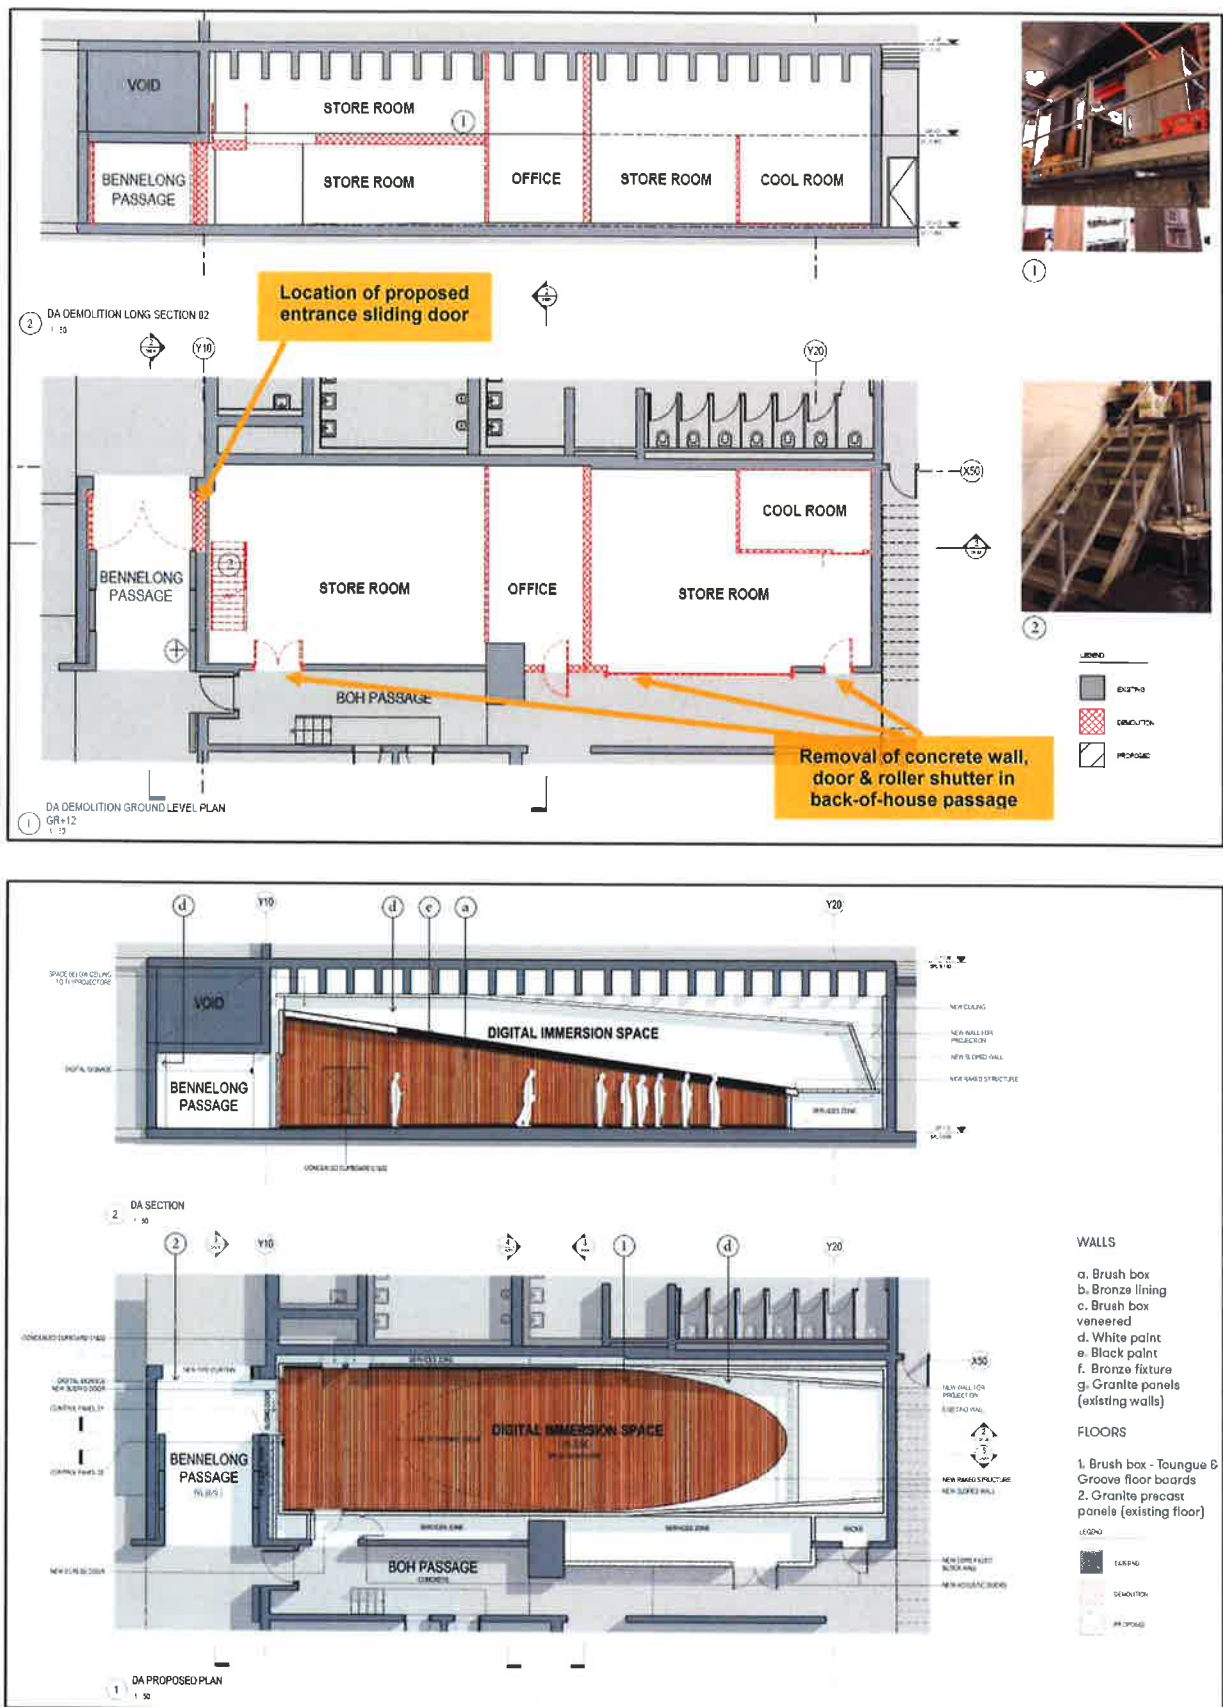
| Section and plan of existing (showing elements to be demolished in red) and proposed works (Base source: Architectural Drawings)
